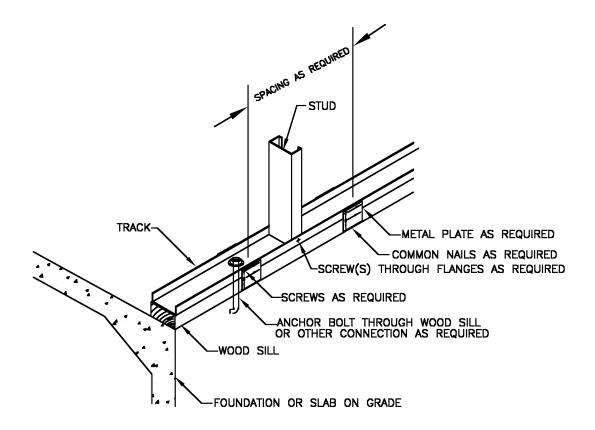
Wall to Foundation/Slab on Grade Connection 2
